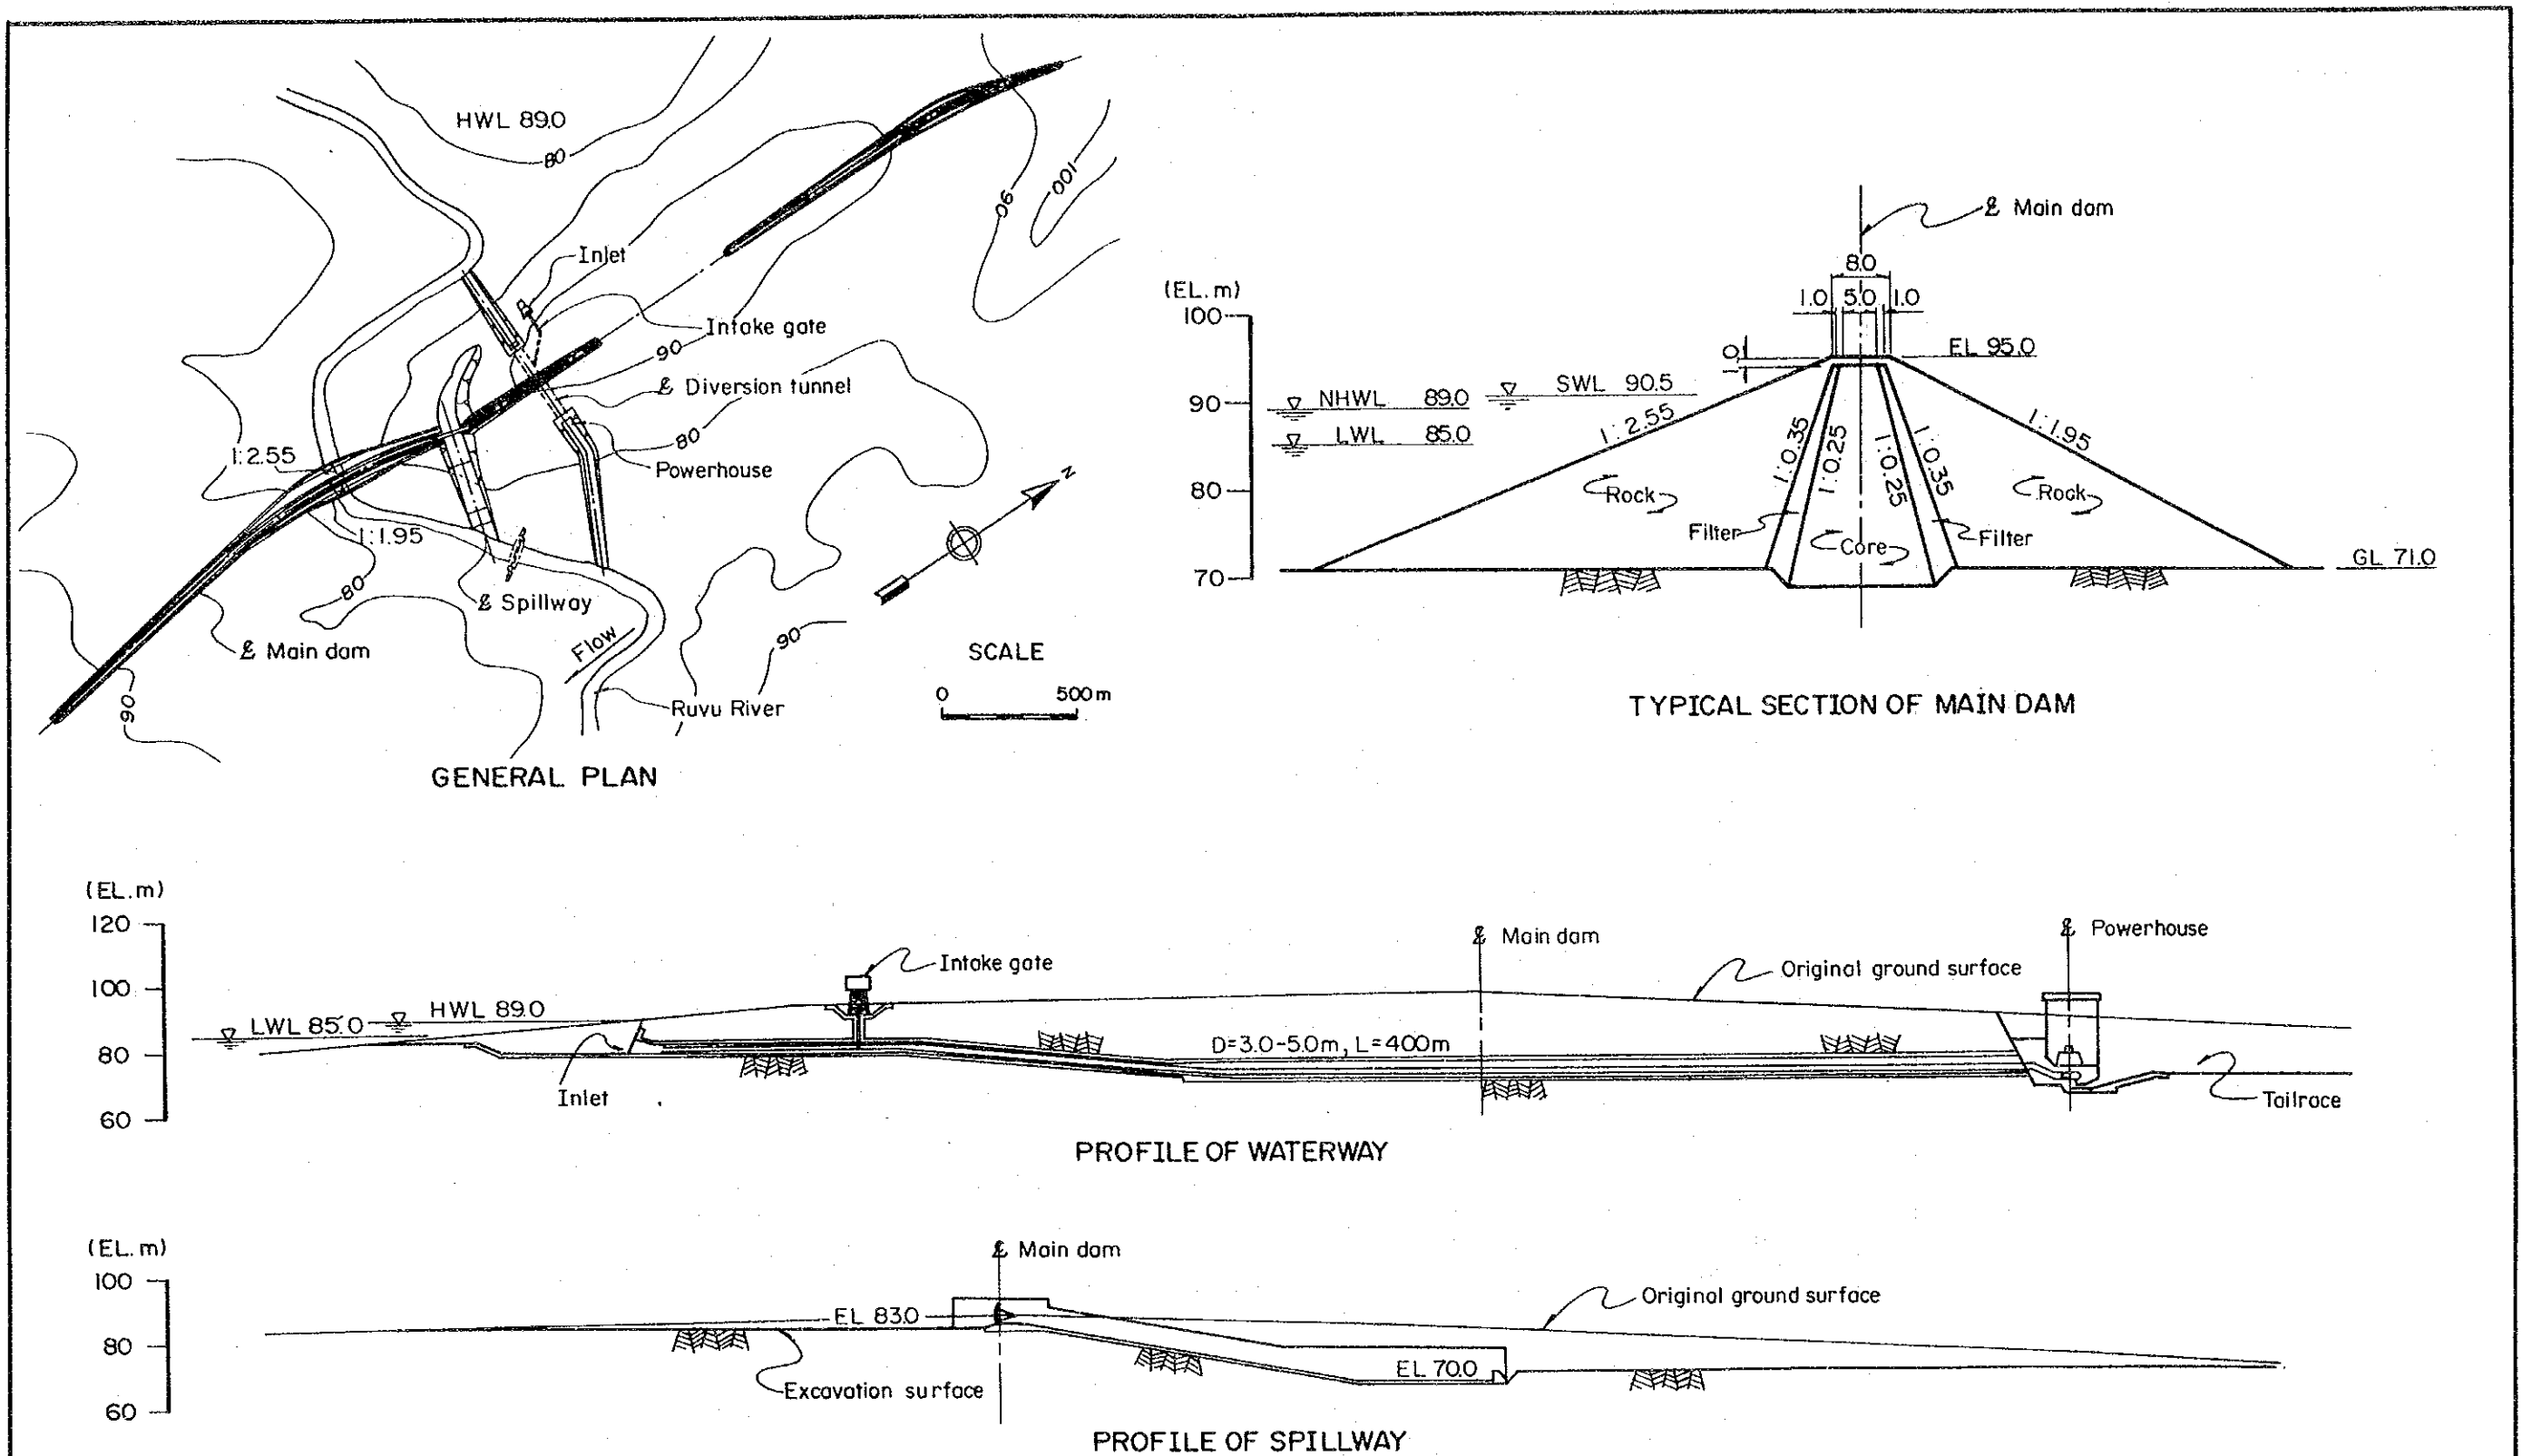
LAYOUT PLAN OF KIDUNDA DAM PROJECT
